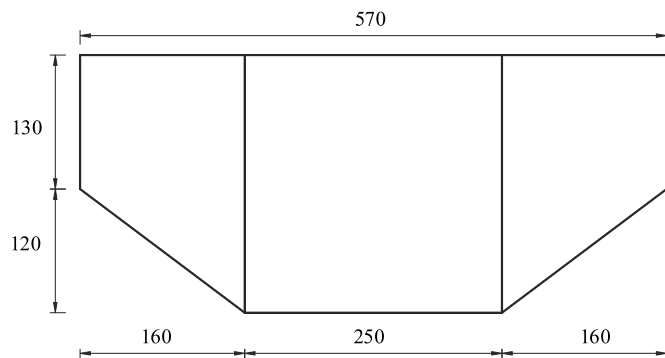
Cross section of the steel footbridge (dimension: mm).
